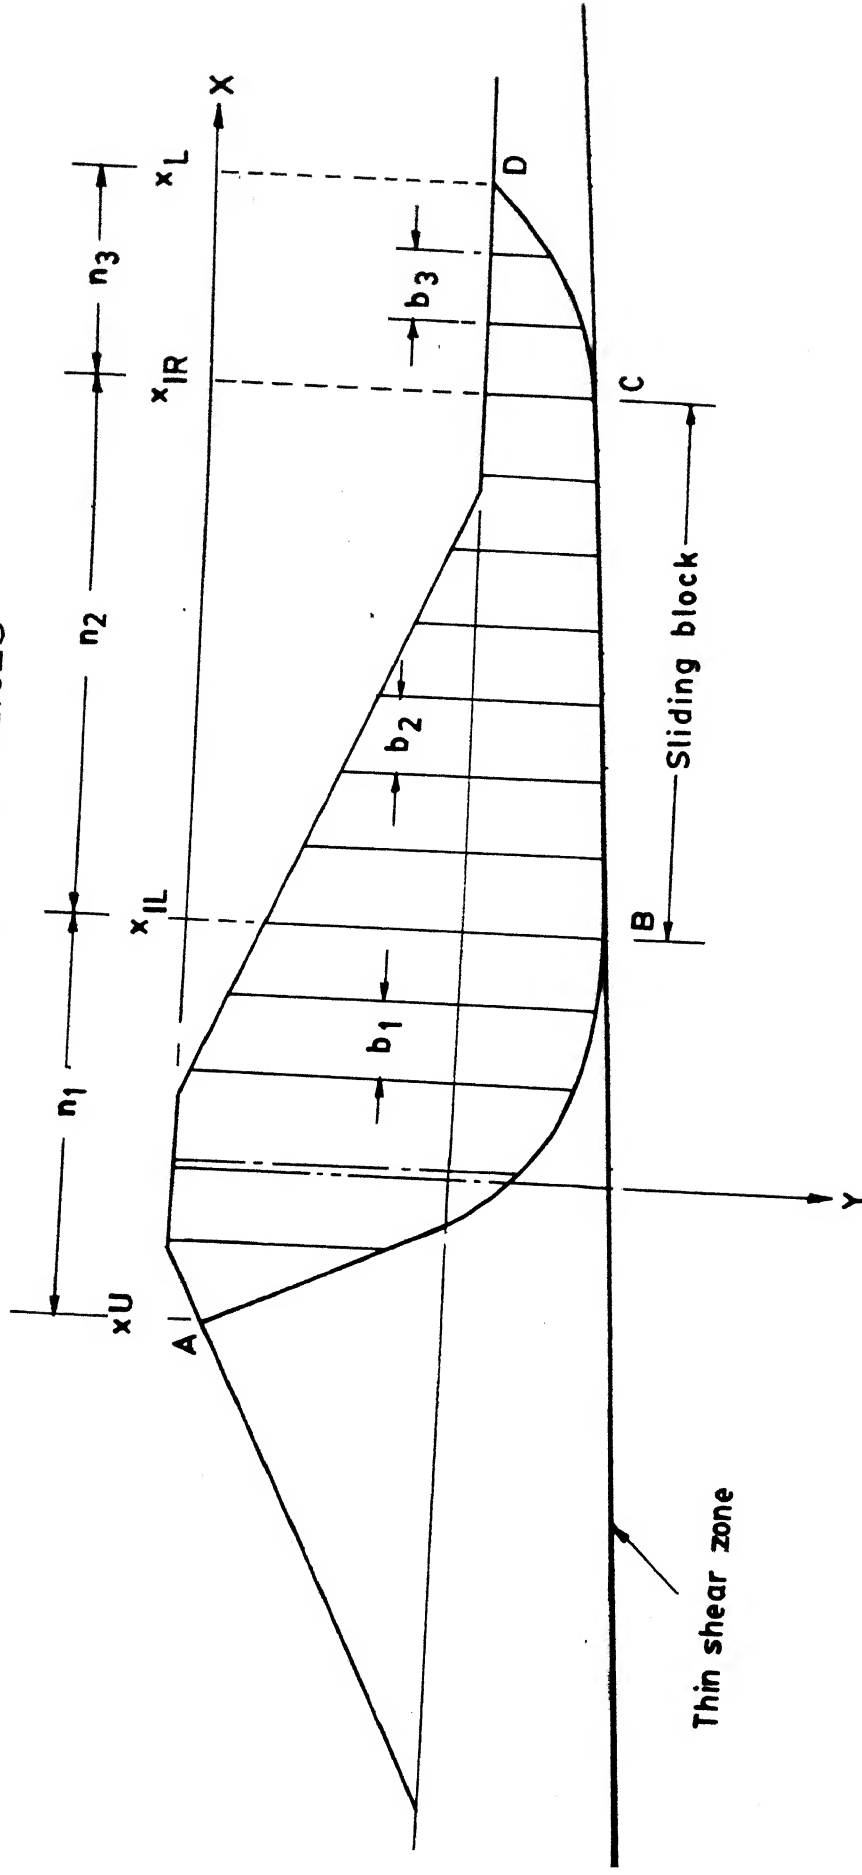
TYPICAL SECTION OF AN EMBANKMENT FOUNDED ON A THIN SHEAR ZONE
